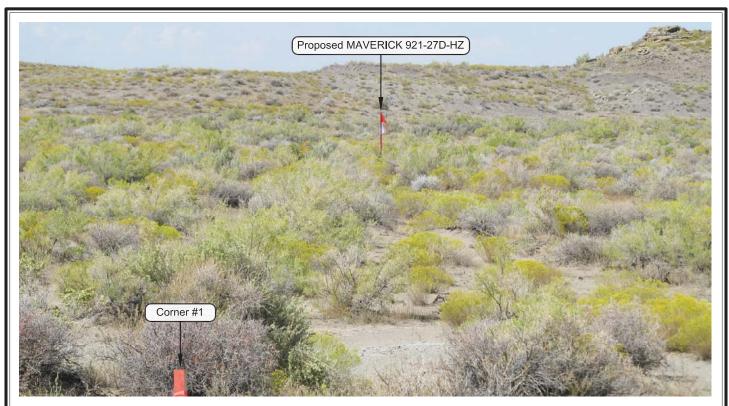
PHOTO VIEW: FROM CORNER #1 TO LOCATION STAKE
